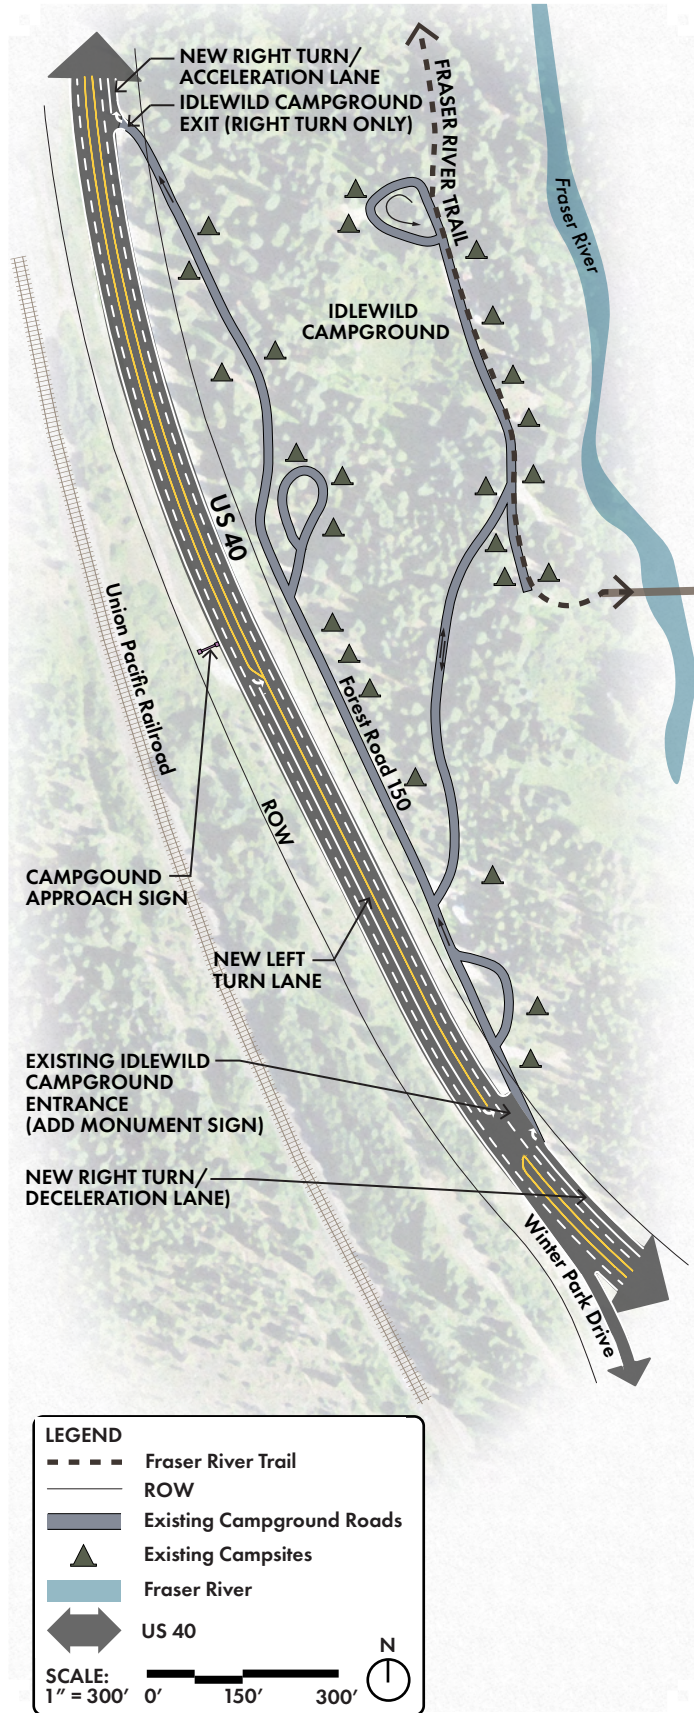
Concept plan for improved access to Idlewild Campground along US 40.
